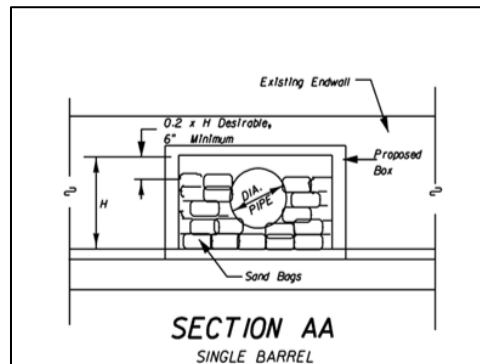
Temporary Drainage at Box Culvert Extension
